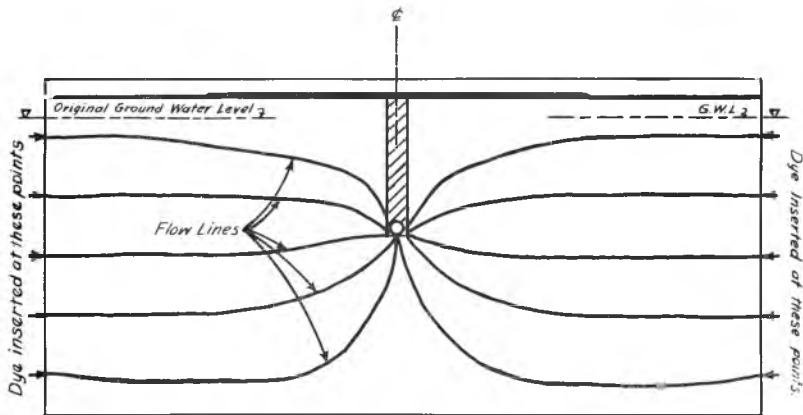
Drain at centerline of roadway. Flat terrain—high ground-water table. Eight-inch perforated pipe—backfill same as surrounding soil. Bottom of pipe is 6 feet below ground-water level.
